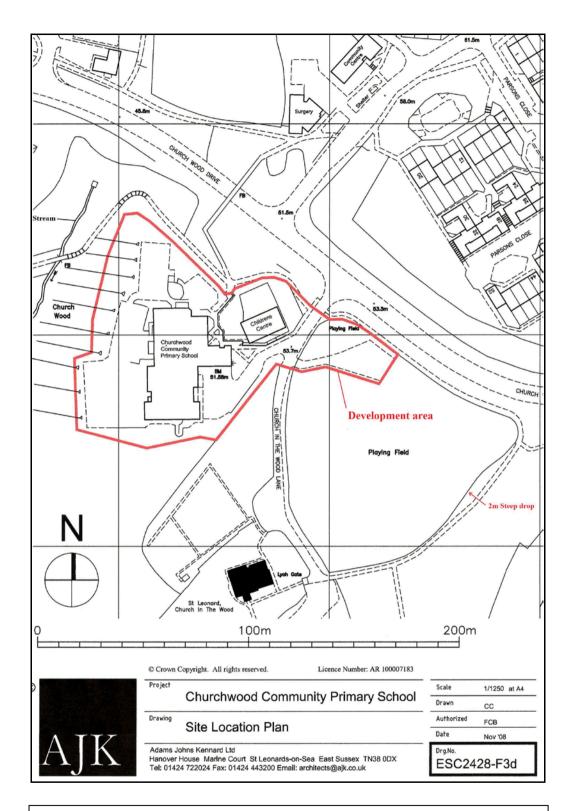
Churchwood School: Site Plan also showing features noted on site visit (Adapted from AJK drawing)
